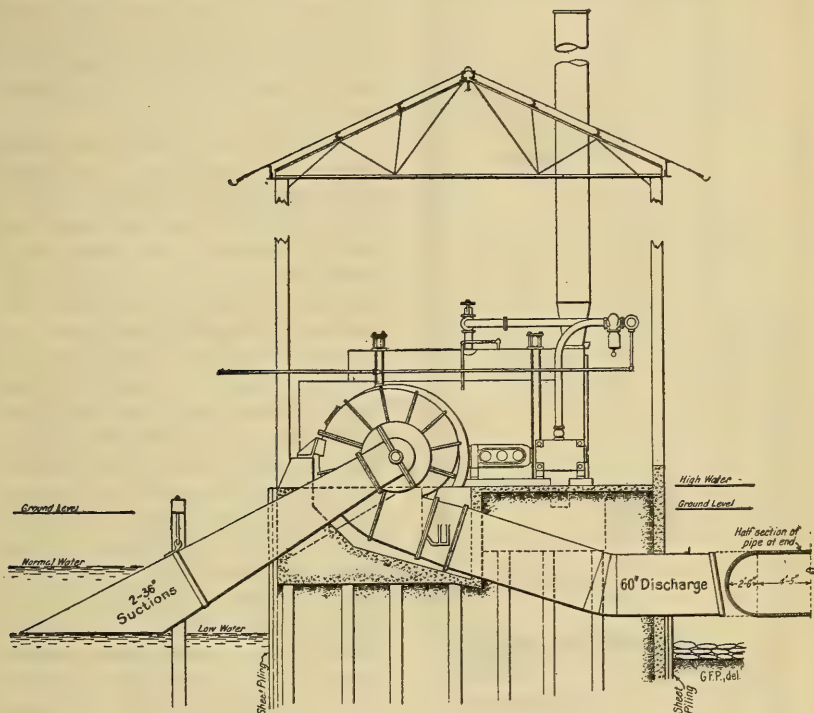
Elevation of pumping plant on area No. 7, Gueydan, La.
